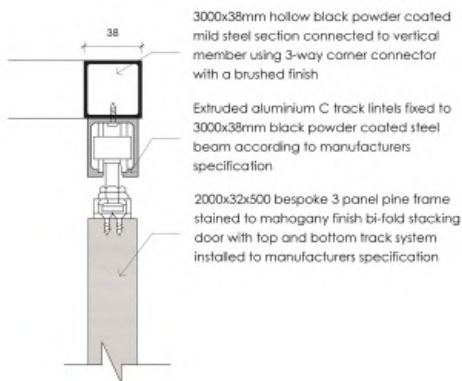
(Left to right) Interior fittings details as shown on 1:20 section (indicated scale @A1)
